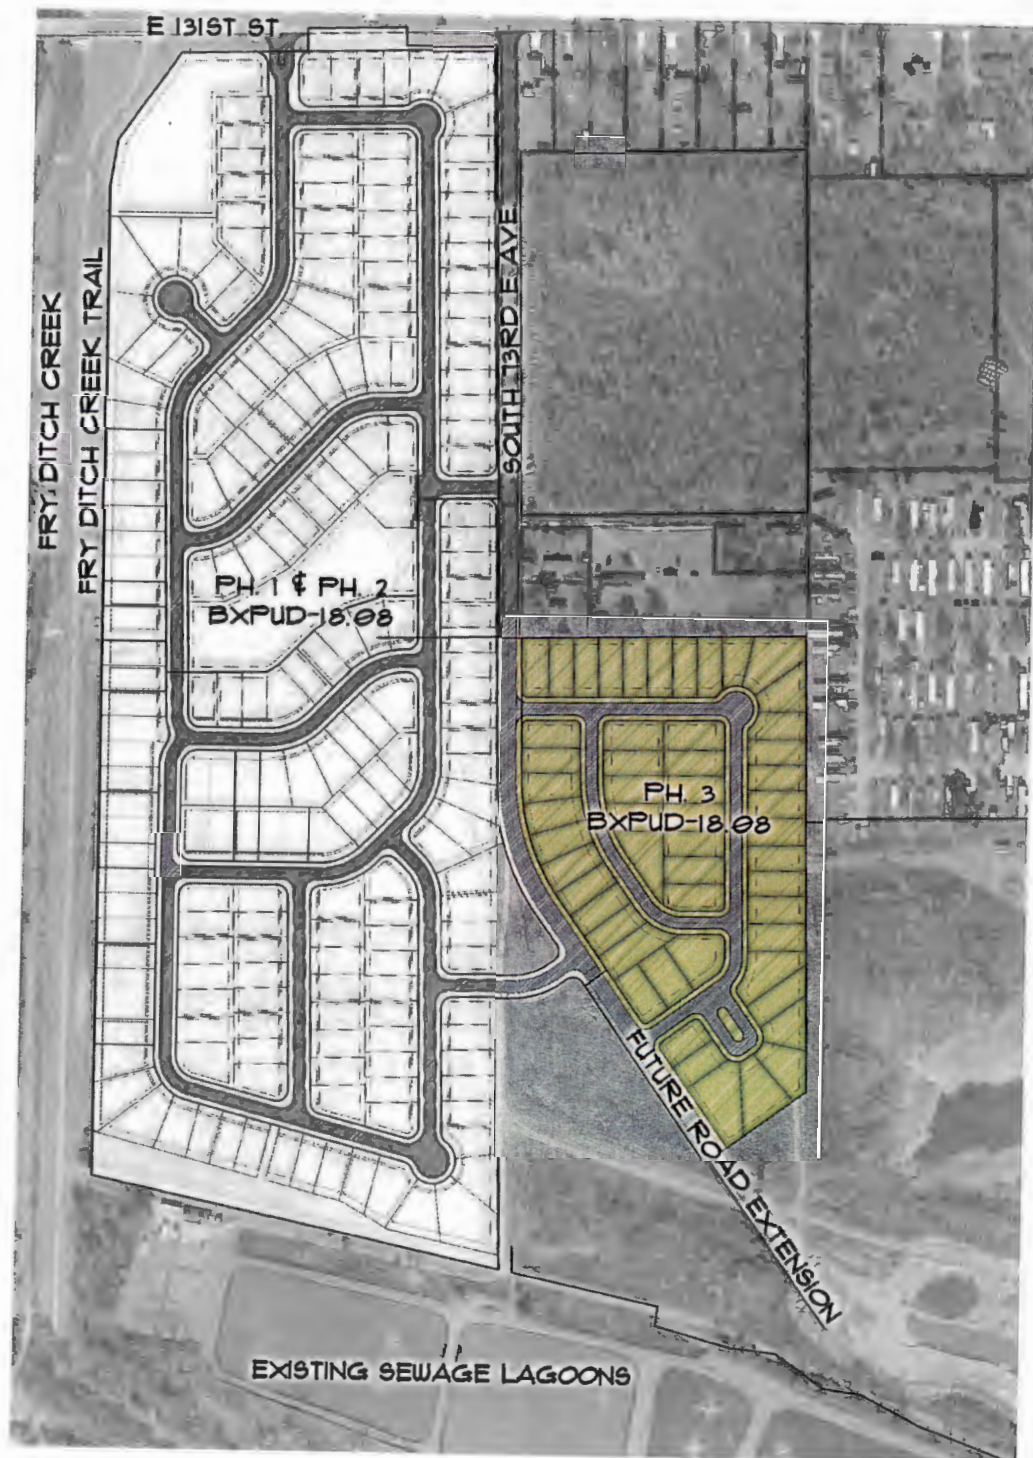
EXHIBIT D: PHASE III PROPOSED CONCEPT PLAN
